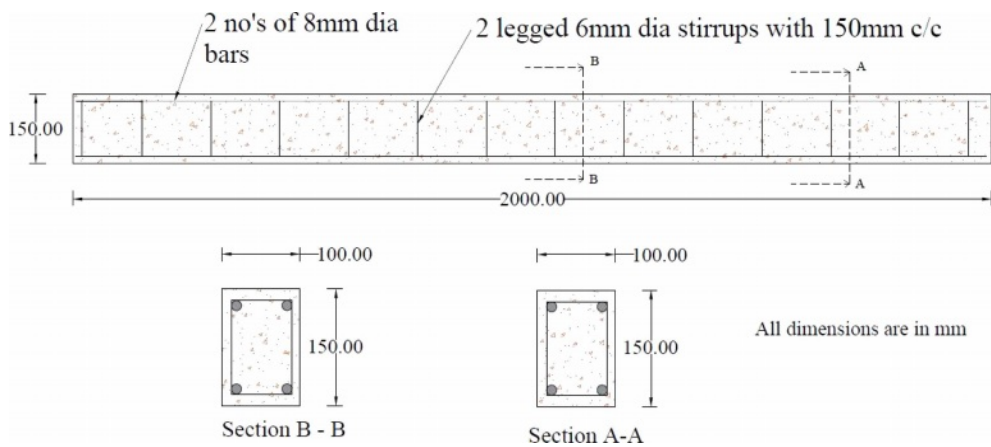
Reinforced Concrete Beam Cross Sectional Details.
